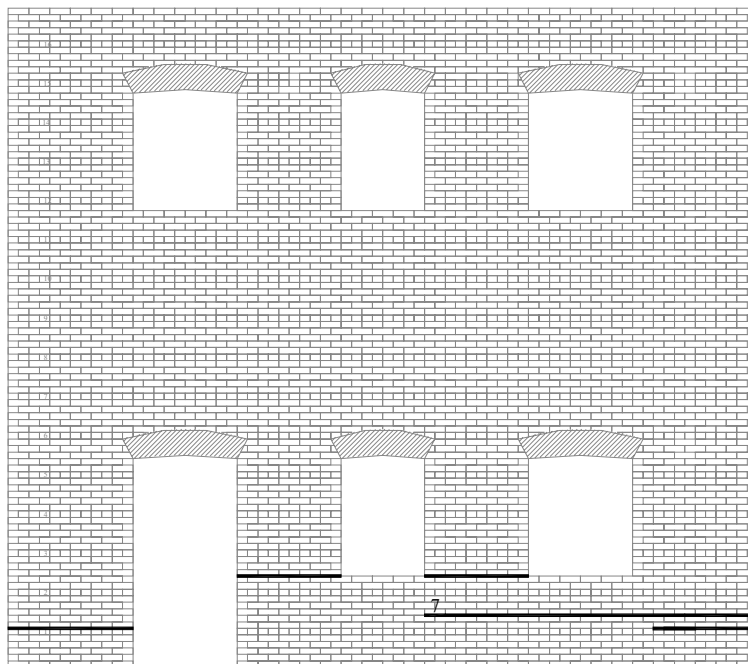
Crack Pattern of Wall B following the Group 1 cycles.
